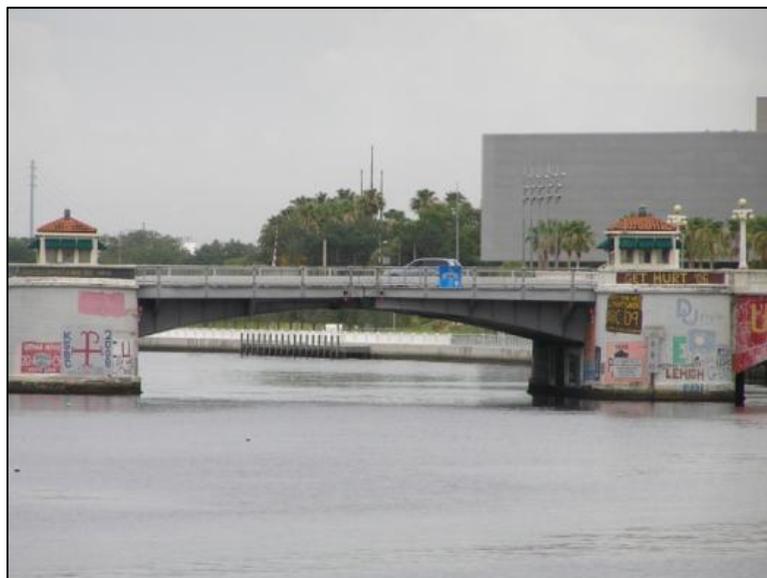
Kennedy Boulevard Bridge, Hillsborough County (No. 100100)
